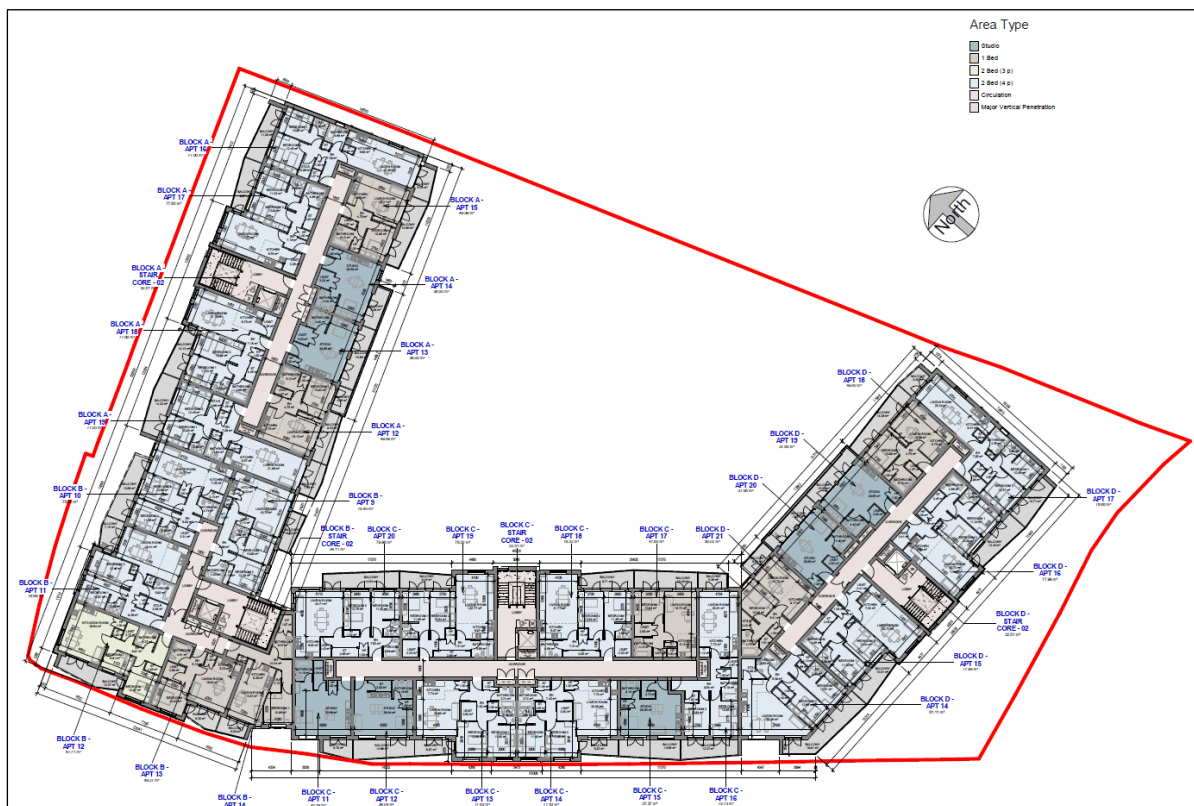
Second floor plan of development approved under ABP Ref. No. 303803-19
